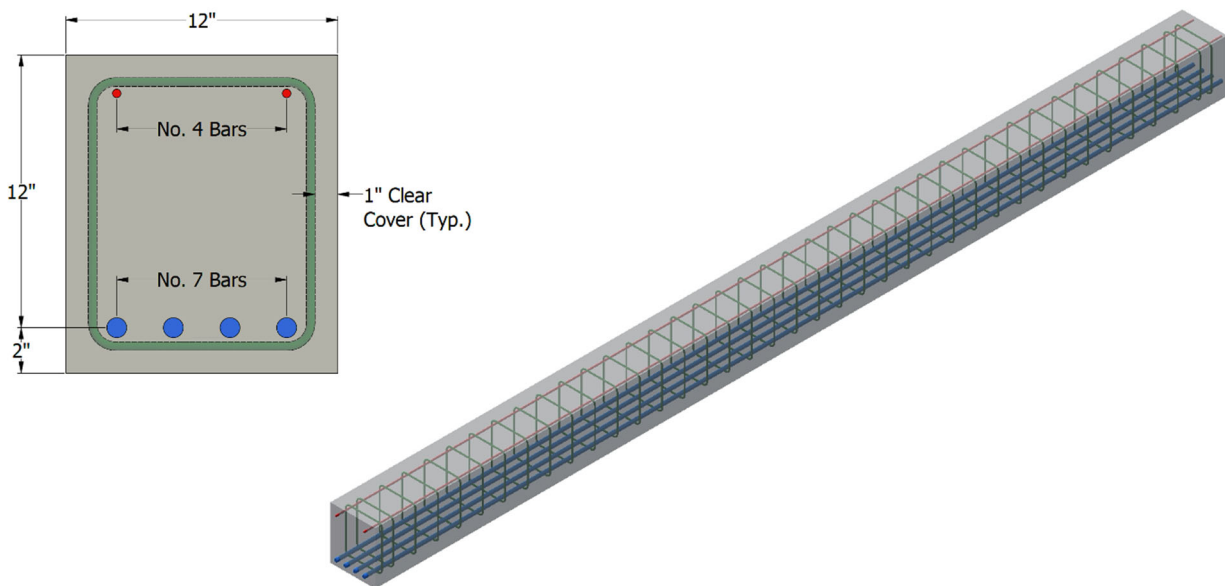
Tension-controlled beam cross section rebar cage schematic.
